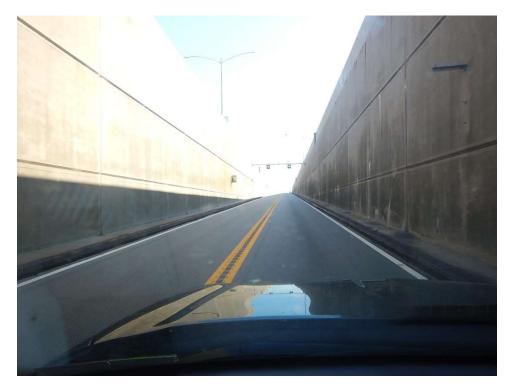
Island 4 Open Approach Roadway (Looking North)
